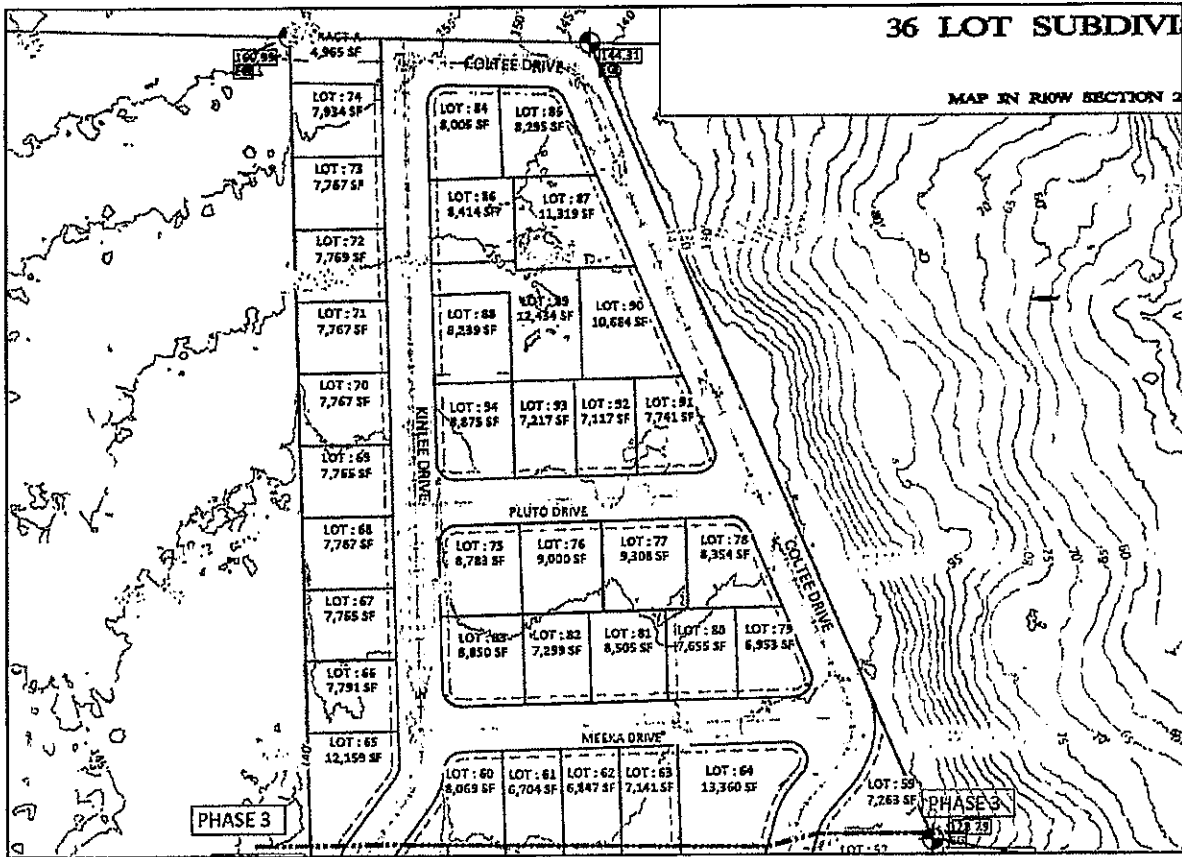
Portion of topographic plan and tentative lot plan, Riverview Meadows Phase 3, prepared by Morgan Civil Engineering, Inc.
